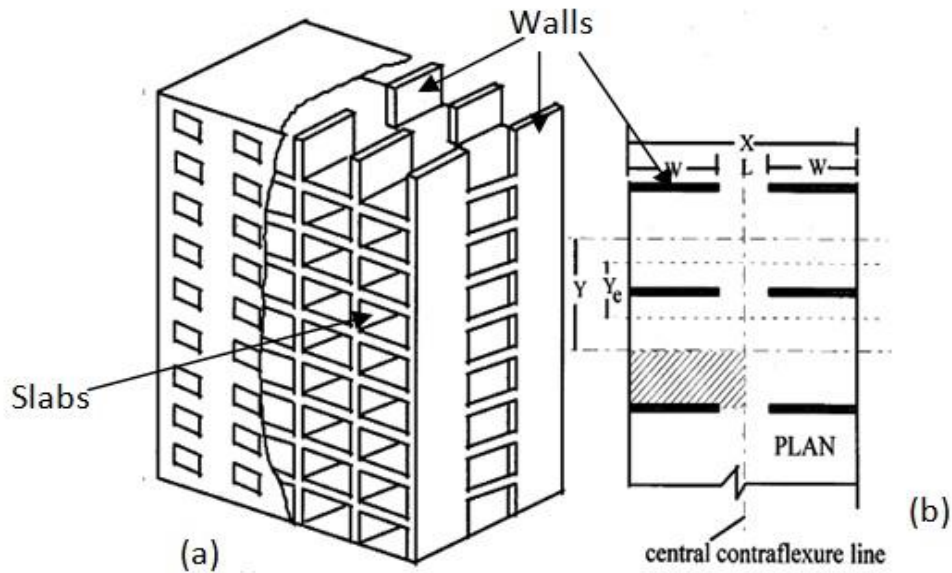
(a) Schematic view with structural components (b) layout plan of coupled shear wall structure (Hossain 2003)
